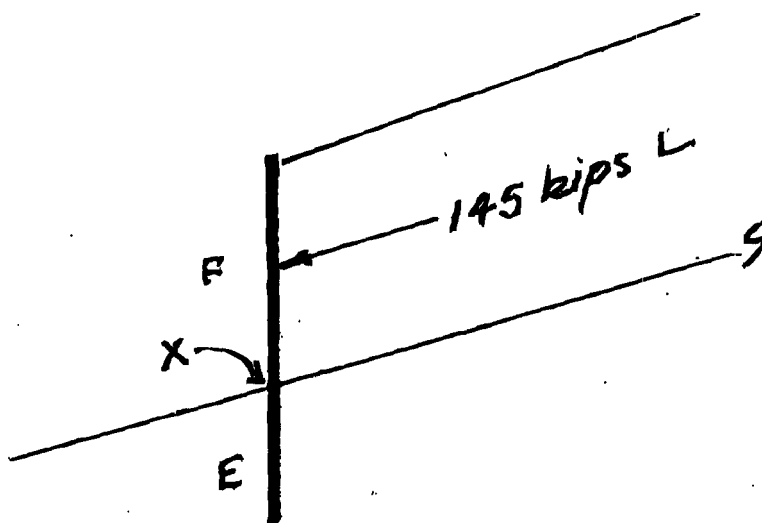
Pile supported Slope Cross-section after Excavation of Slide Debris.
